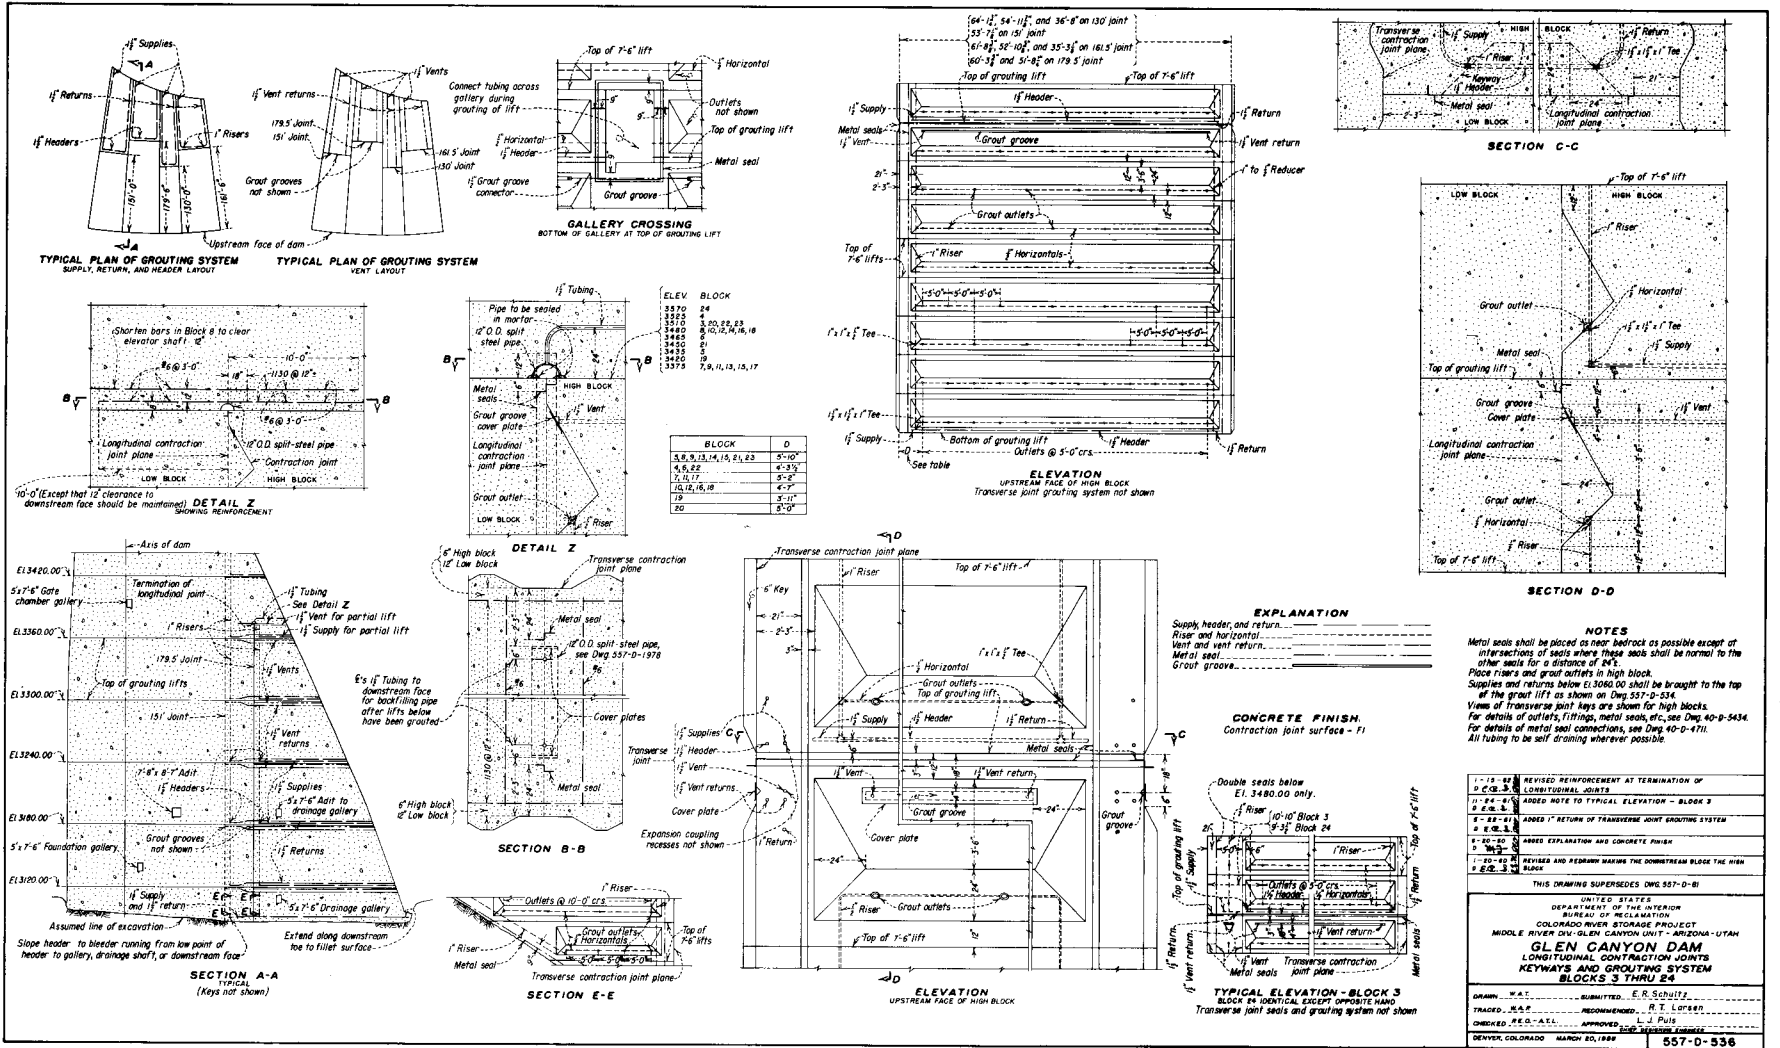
Dam longitudinal contraction joints—Keyways and grouting system at blocks 3 through 24.
